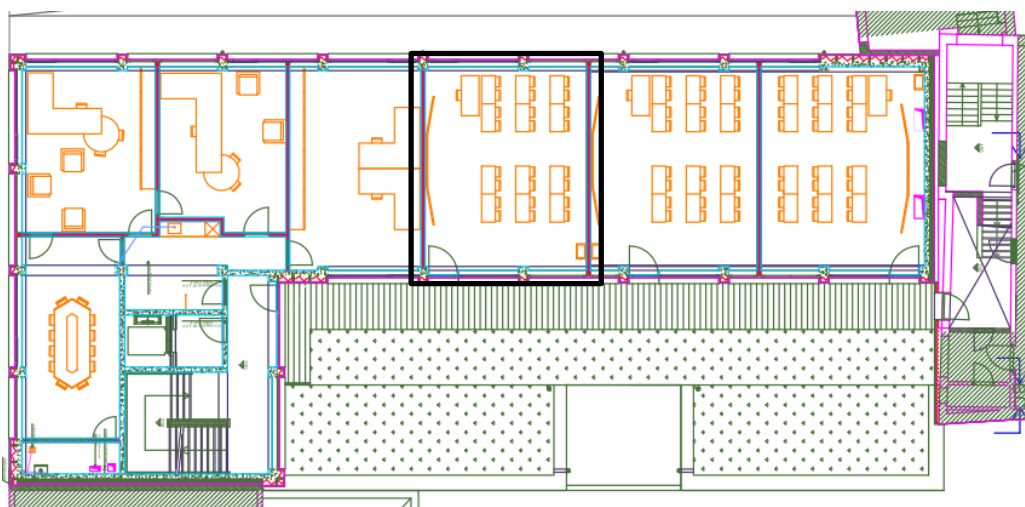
Floor plan of new passive school building block, classroom indicated with a black rectangular
